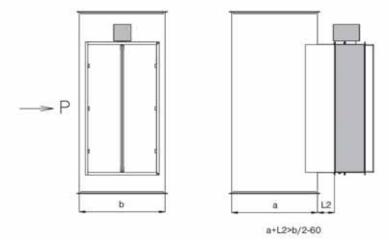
Vertical damper fitting on the duct-EN 1366-9
